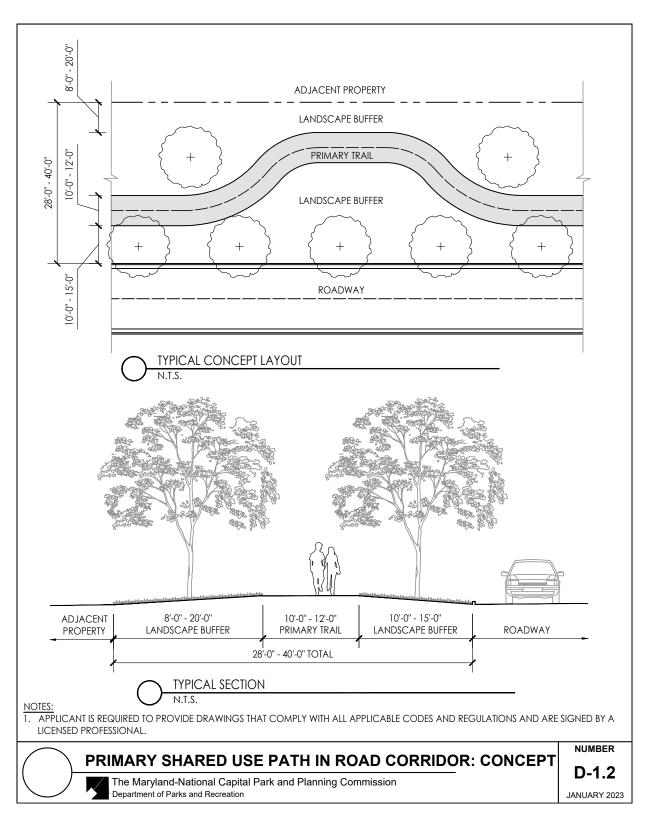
Typical Section and Concept Layout: Shared-Use Path in Roadway Corridor
